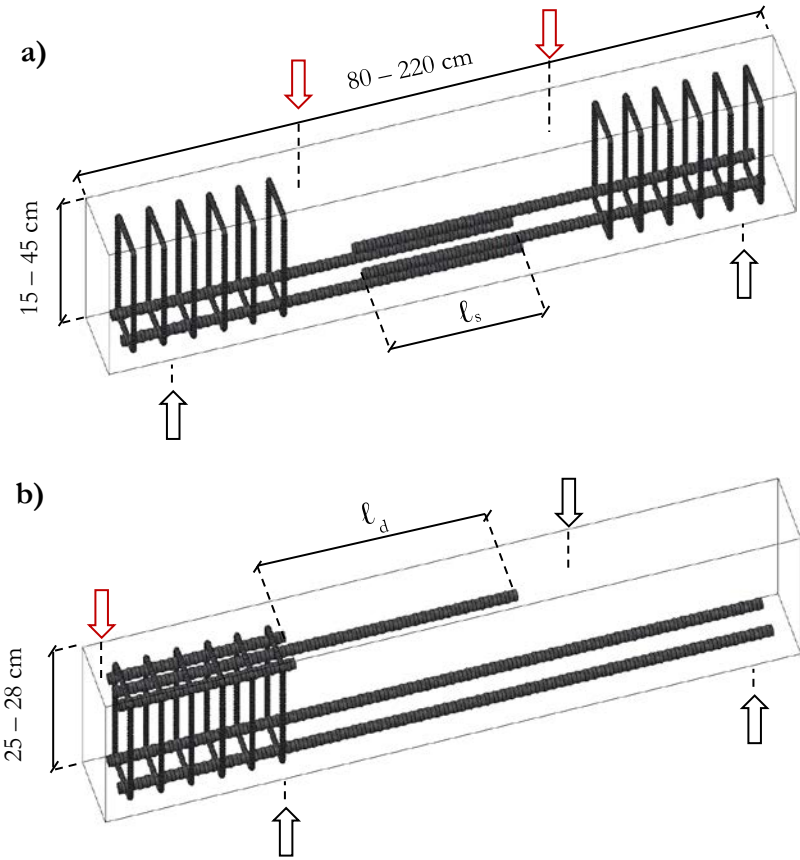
(a) “Beam-splice” and (b) a “development length” specimen (adapted from [42])
